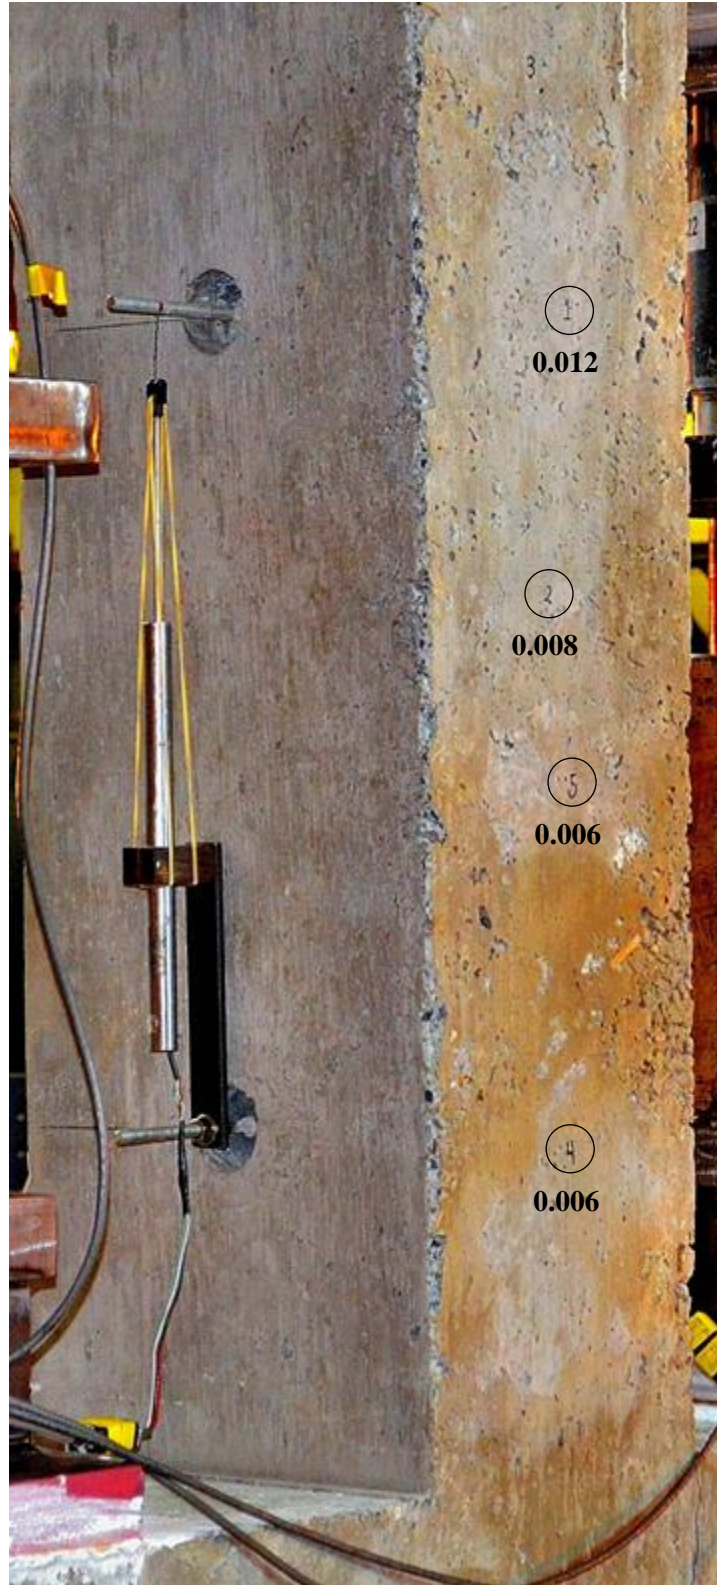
Cracks on west face of TS02 at Load Step 09
